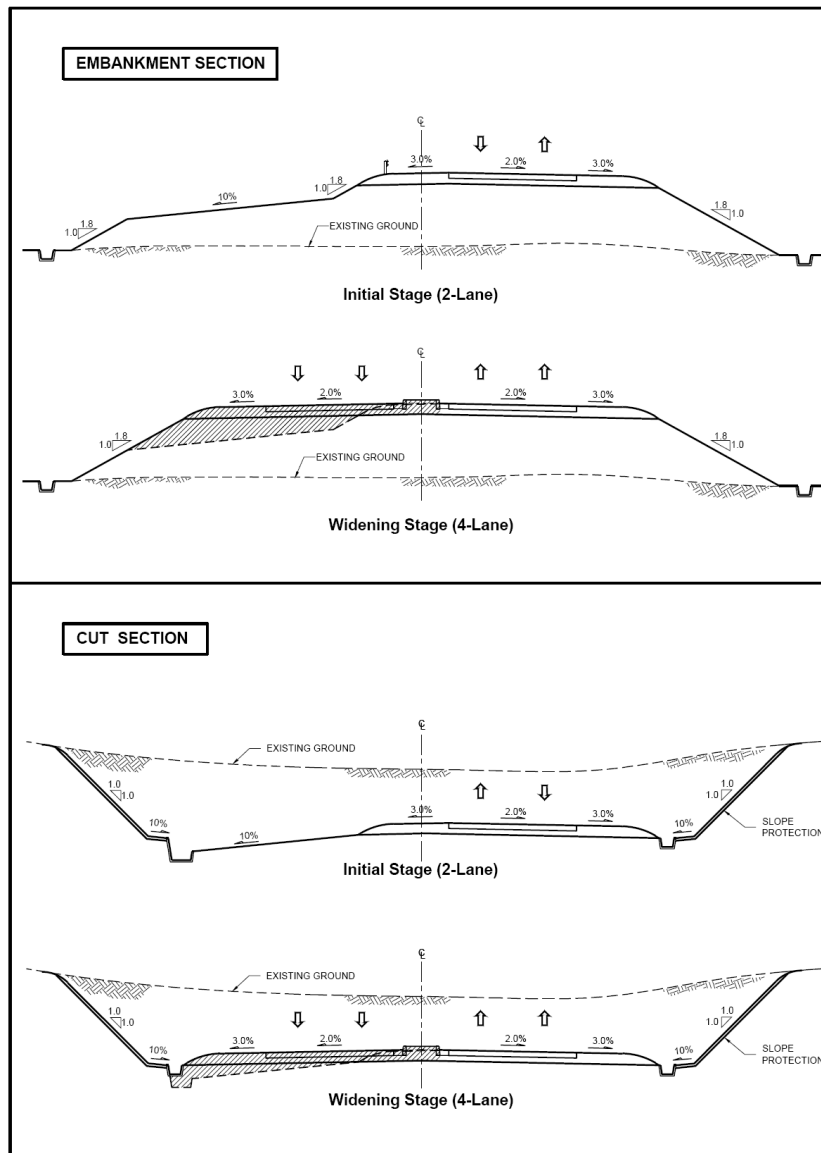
TYPICAL CROSS SECTION (INITIAL AND WIDENING) CONTROL POINT
